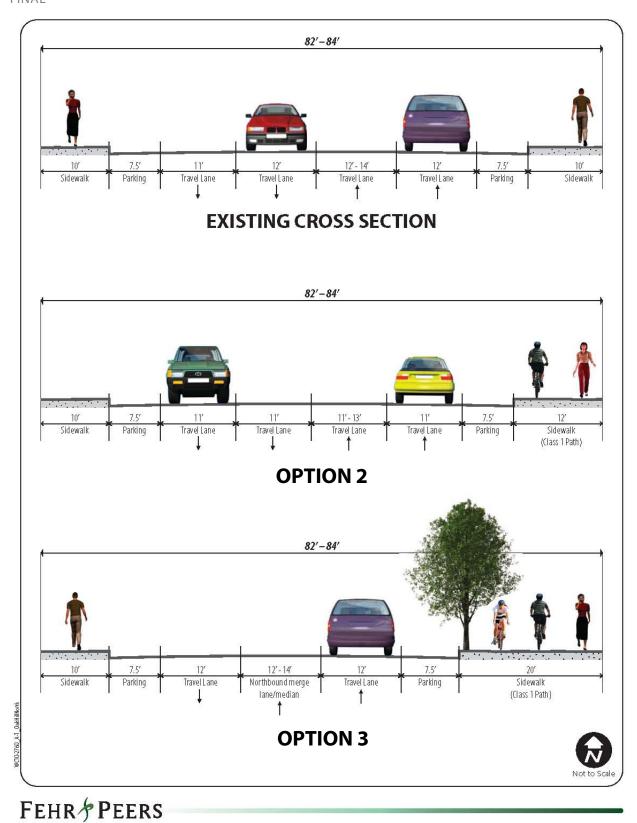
Oak Hill Road North of SR 24: Existing and Proposed Cross Sections
